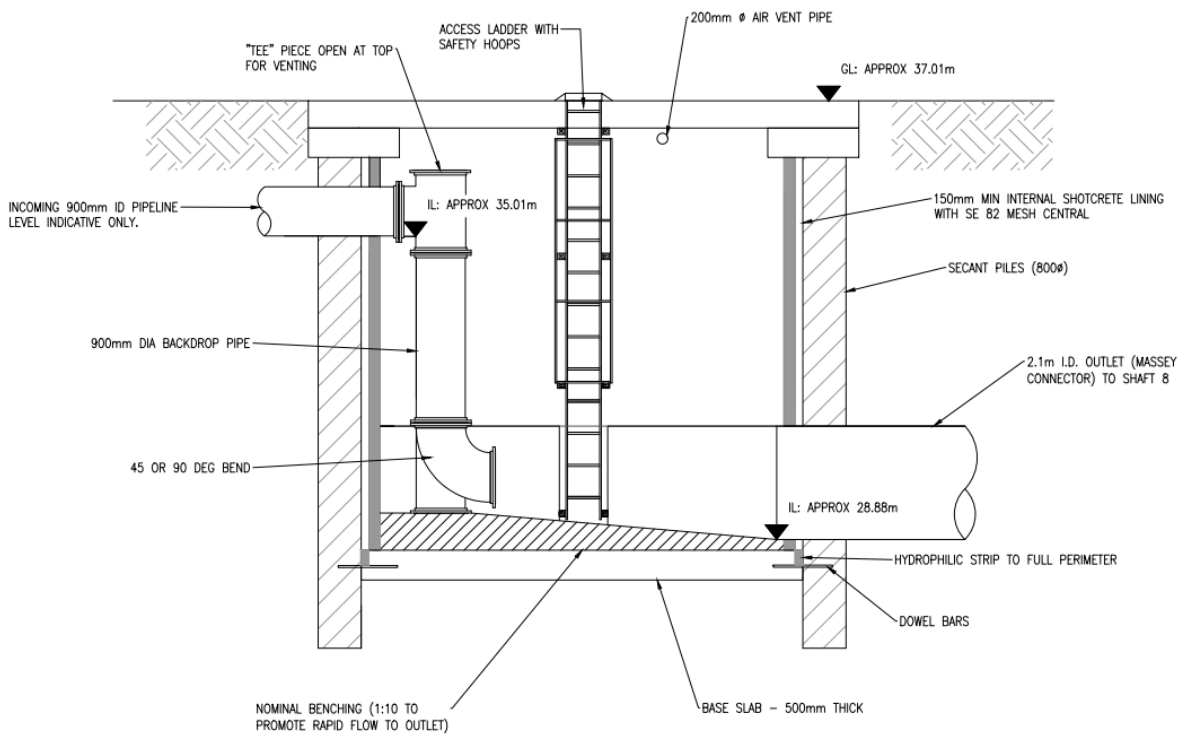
Cross section view of the break pressure chamber (snip from Drawing 2013661.801, Mott MacDonald, provided in Appendix A).
